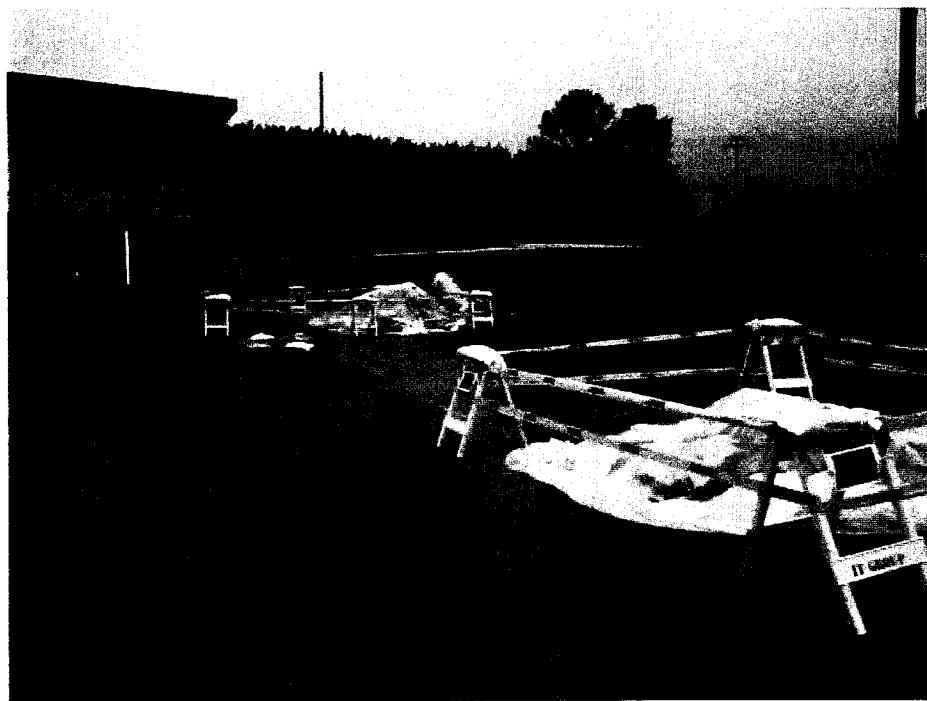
Excavation area and soil stockpiles at Training Aids Building 267, Parcel 166(7). Photo taken facing Northwest.
